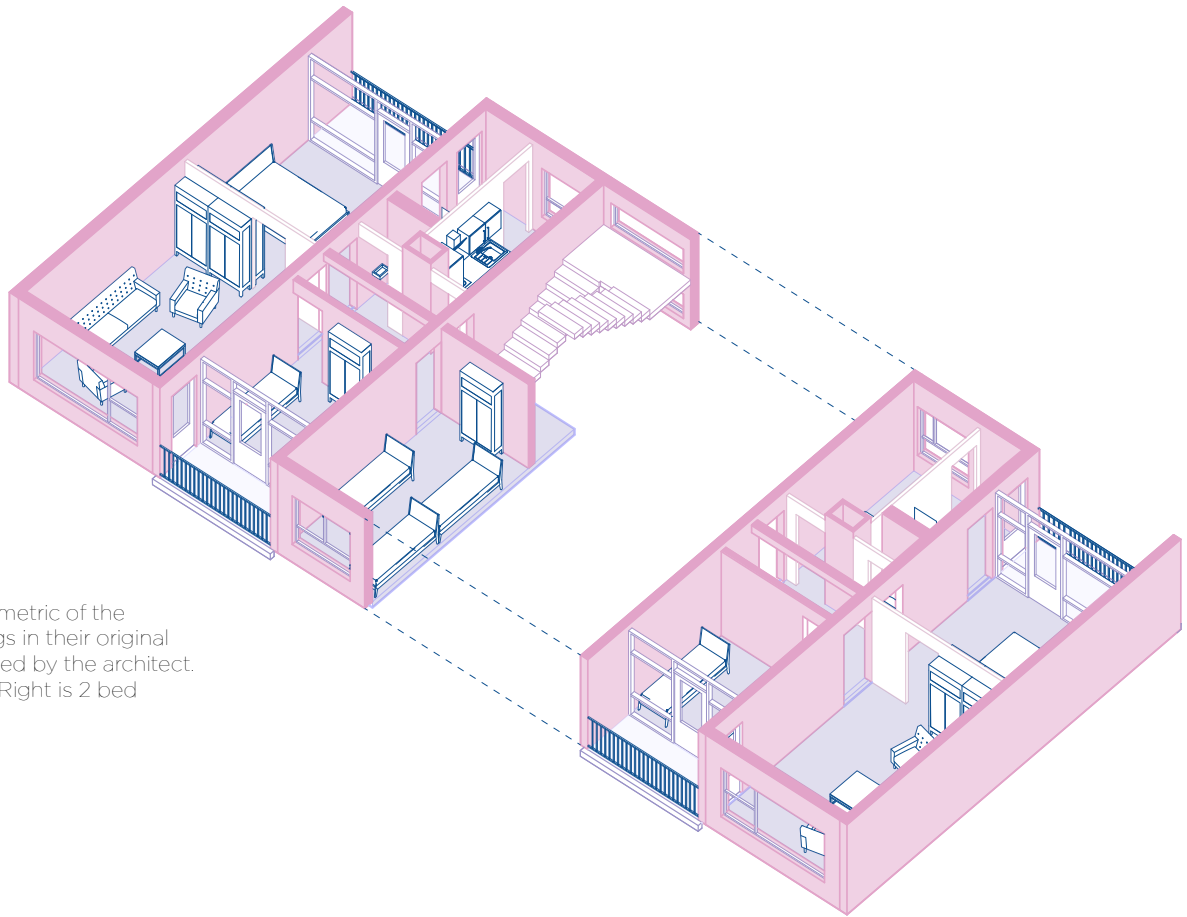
Axonometric of the existing dwellings in their original layout as intended by the architect. Left: 3 bed and Right is 2 bed (By Author)
